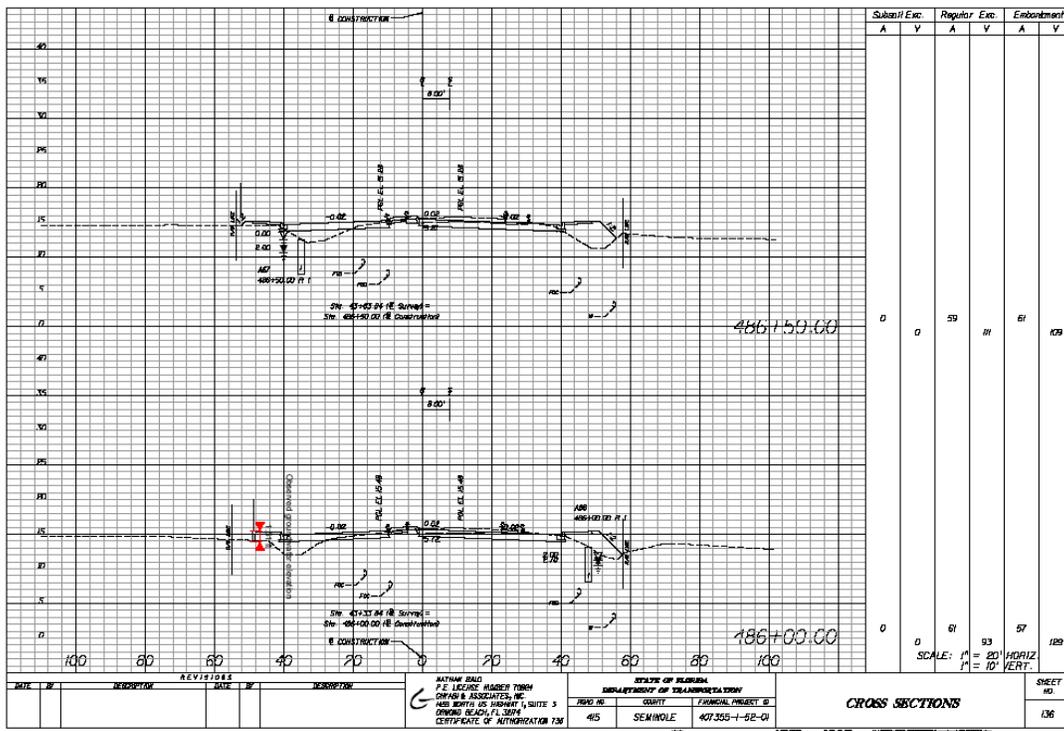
Station 486+00 cross section showing ground water measurement collected from sidewalk grade at a depth of 1.51 feet below grade.
